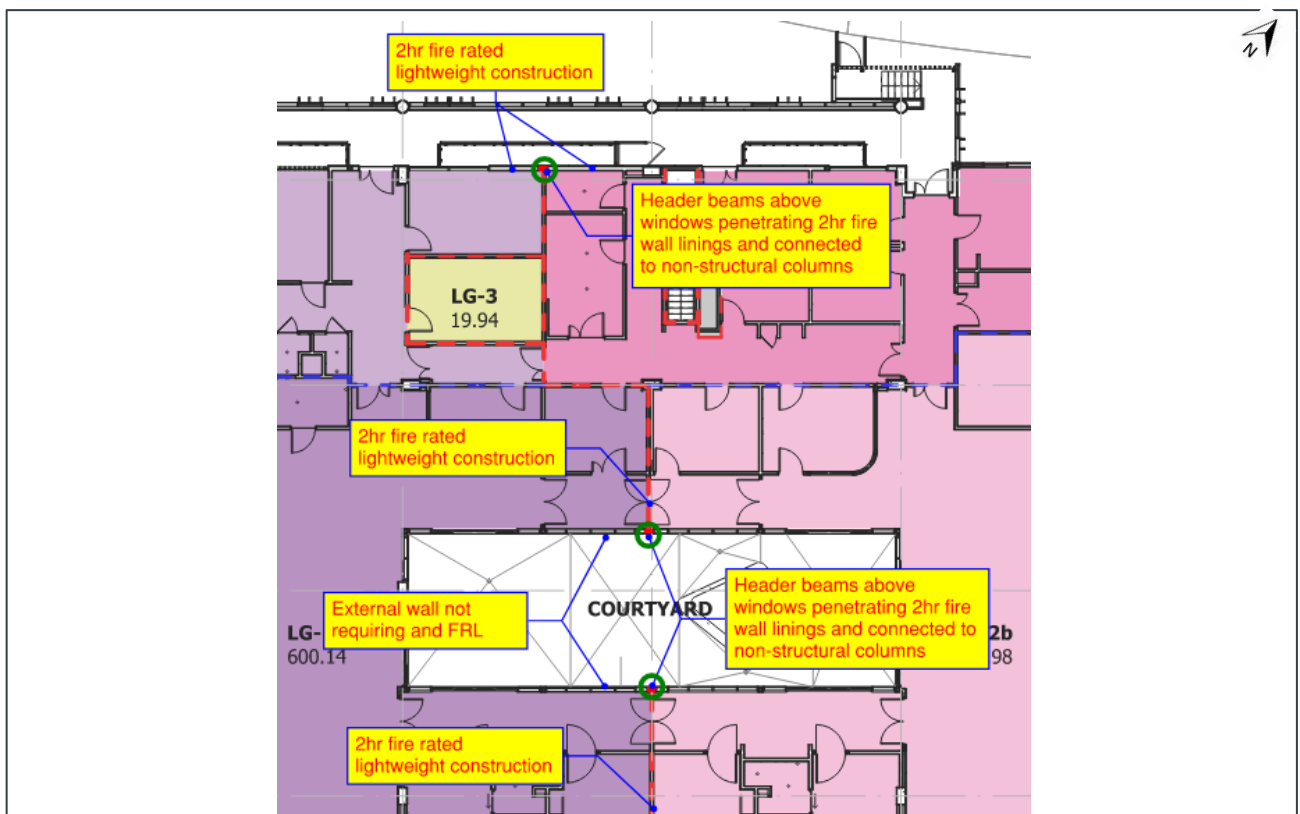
Outline of fire walls on structural model indicating steel header beam connections in red (roof structure not shown) – Lower Ground
